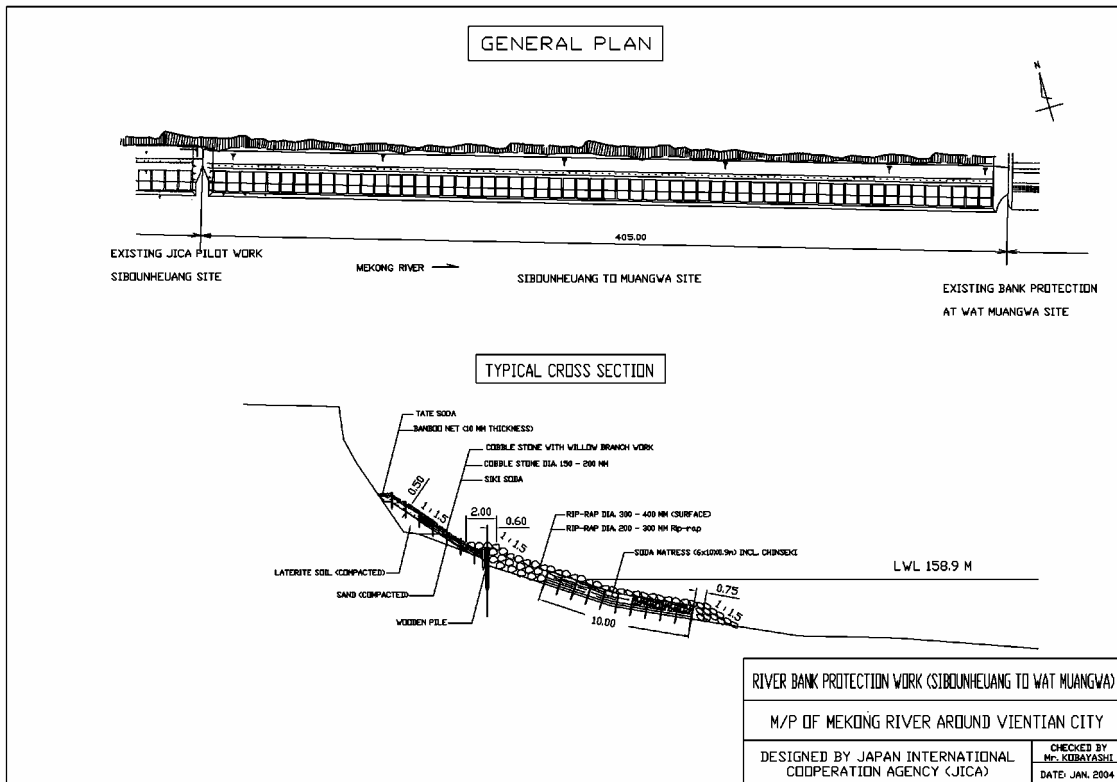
(4/4) Preliminary Design of Riverbank Protection Works (Sibounheuang - Muang Wa Site)
